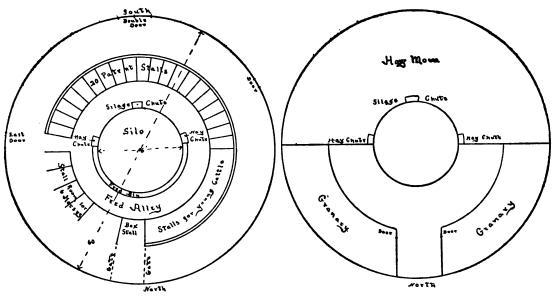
A WISCONSIN DAIRY BARN (FIRST FLOOR AND HAY MOW PLANS).
